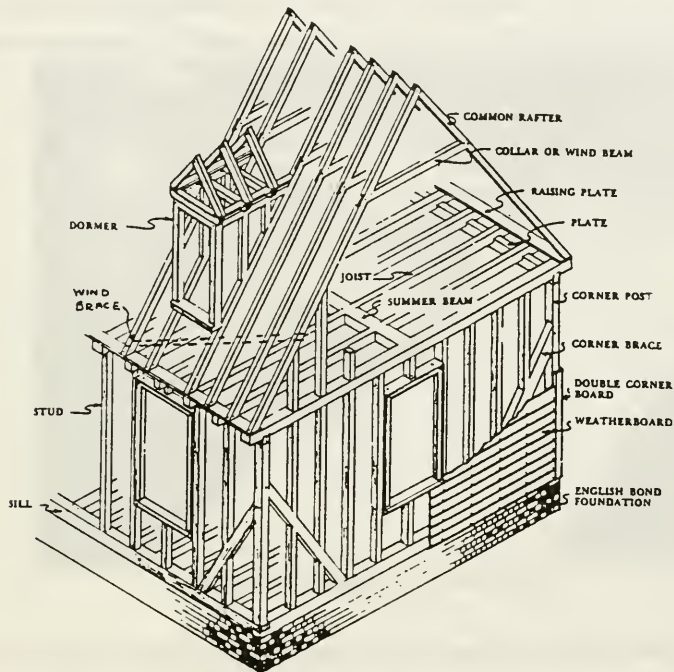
Generic Tidewater Braced Frame Structure Similar to Little Manor. ¹
